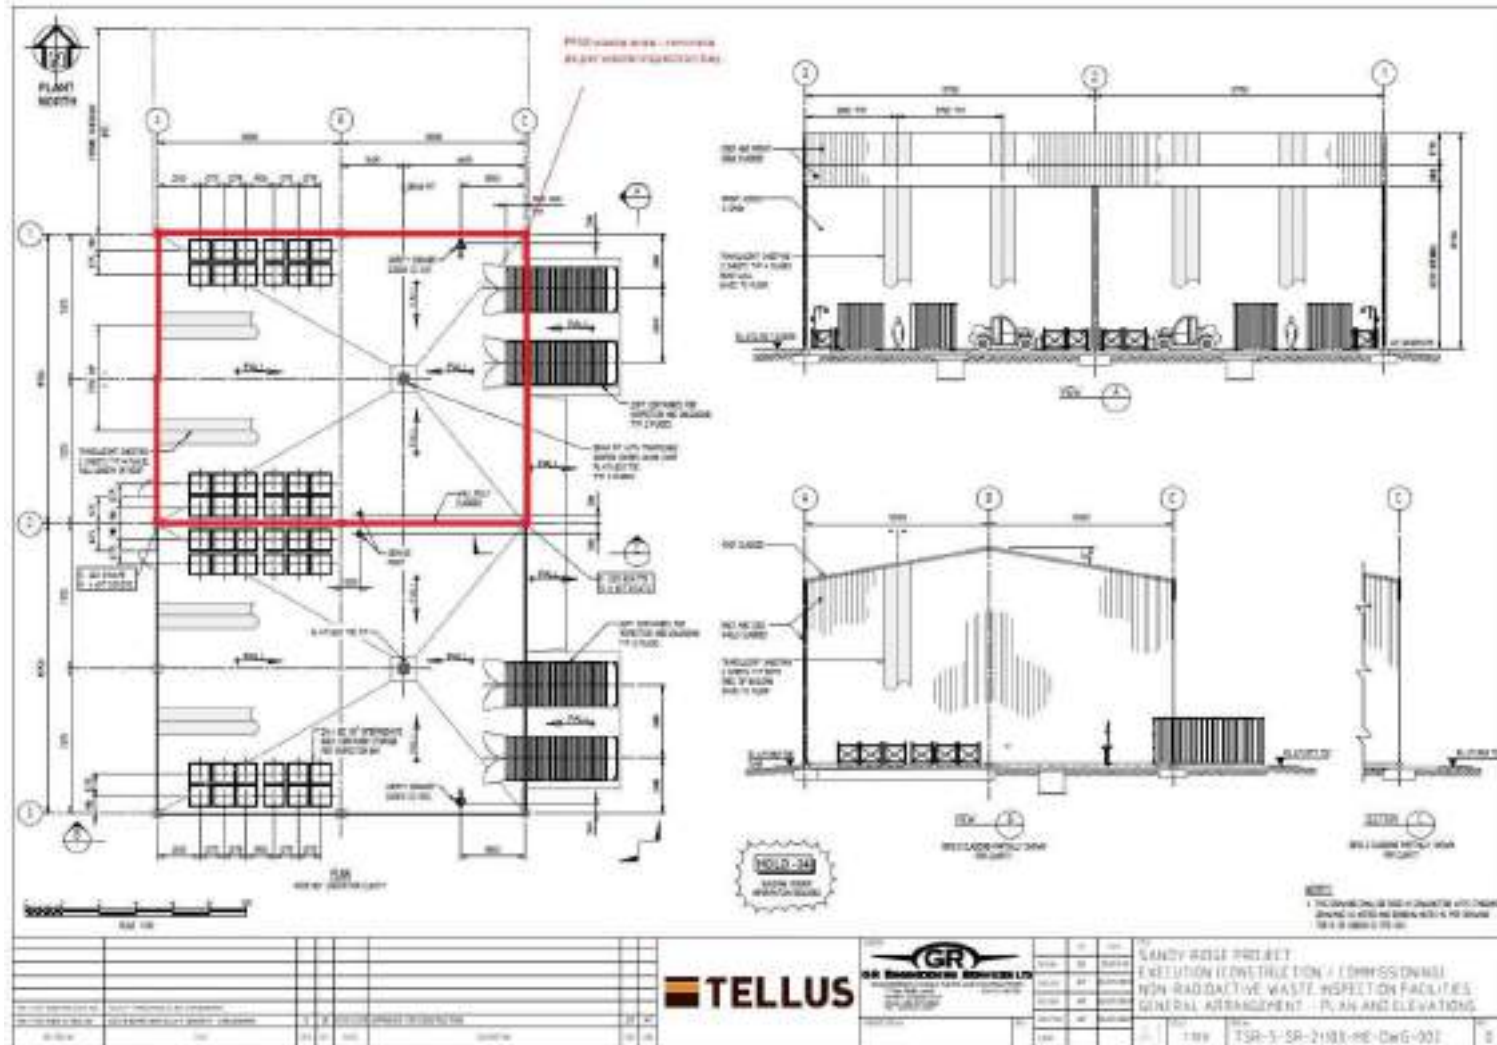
Construction detail – PFAS Contaminated Waste Storage Area (construction specification to match that for the Non-Radioactive Waste Inspection Warehouse, as referenced by the marked red box)
